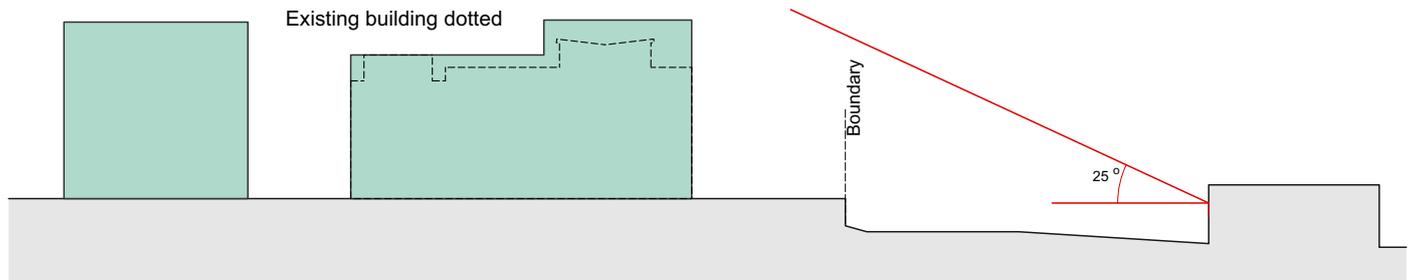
Proposed site plan showing the zone of influence and sections through window wall of adjacent residential properties.
